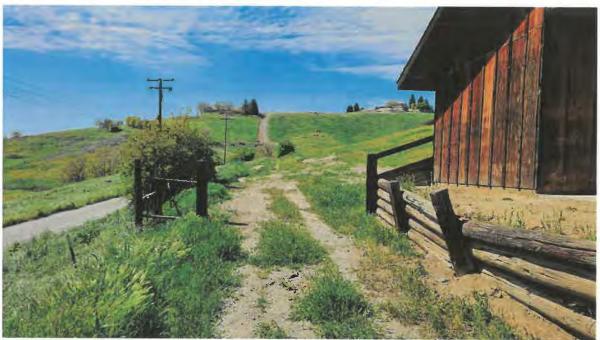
Proposed pipeline spur along a residential perimeter road leading to an area in the distance just at the foot of the steep dirt road leading up to the distant ridge.
